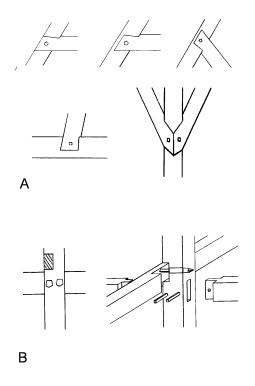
Basic types of carpenter's joints in medieval roof constructions: a – lap dovetail joint, b – mortise-and-tenon joint
